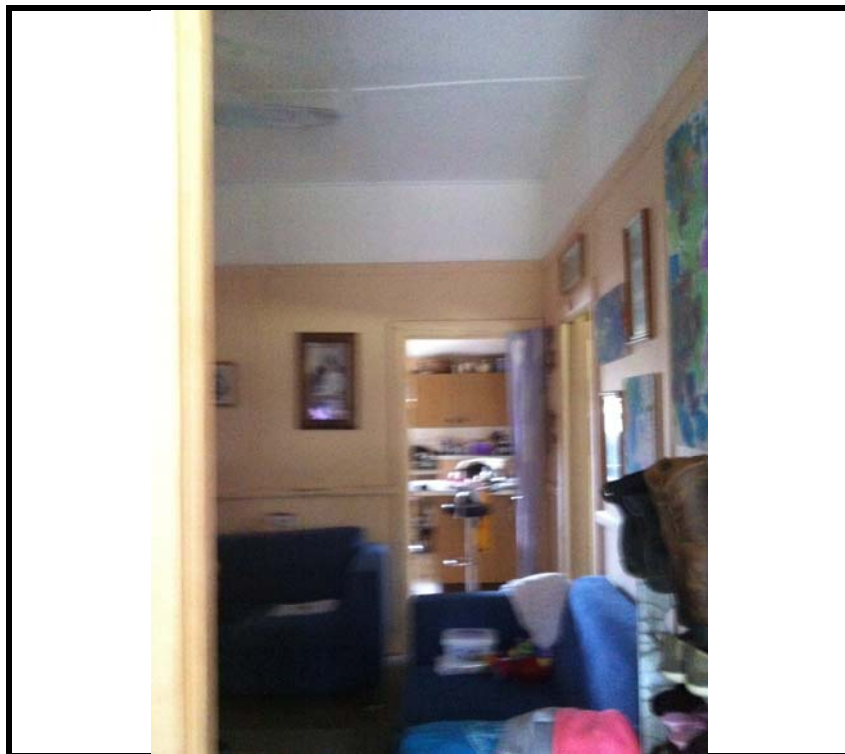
ACM sheeting used in walls and the ceiling of the living room at 5 McLeod Road.
